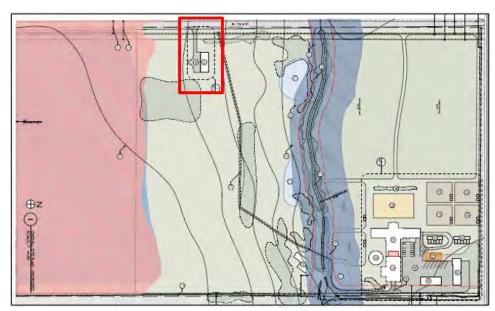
Proposed site plan, with heavy equipment storage building indicated in red. NOTE: North is to the right on the image.
